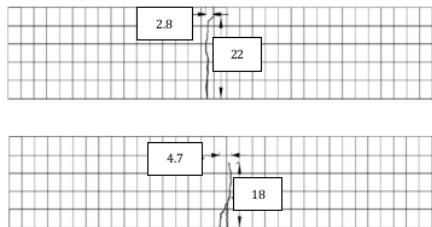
Crack pattern for the:(Top) Pivot hooks beam 1, (Bottom) Pivot hooks beam 2
